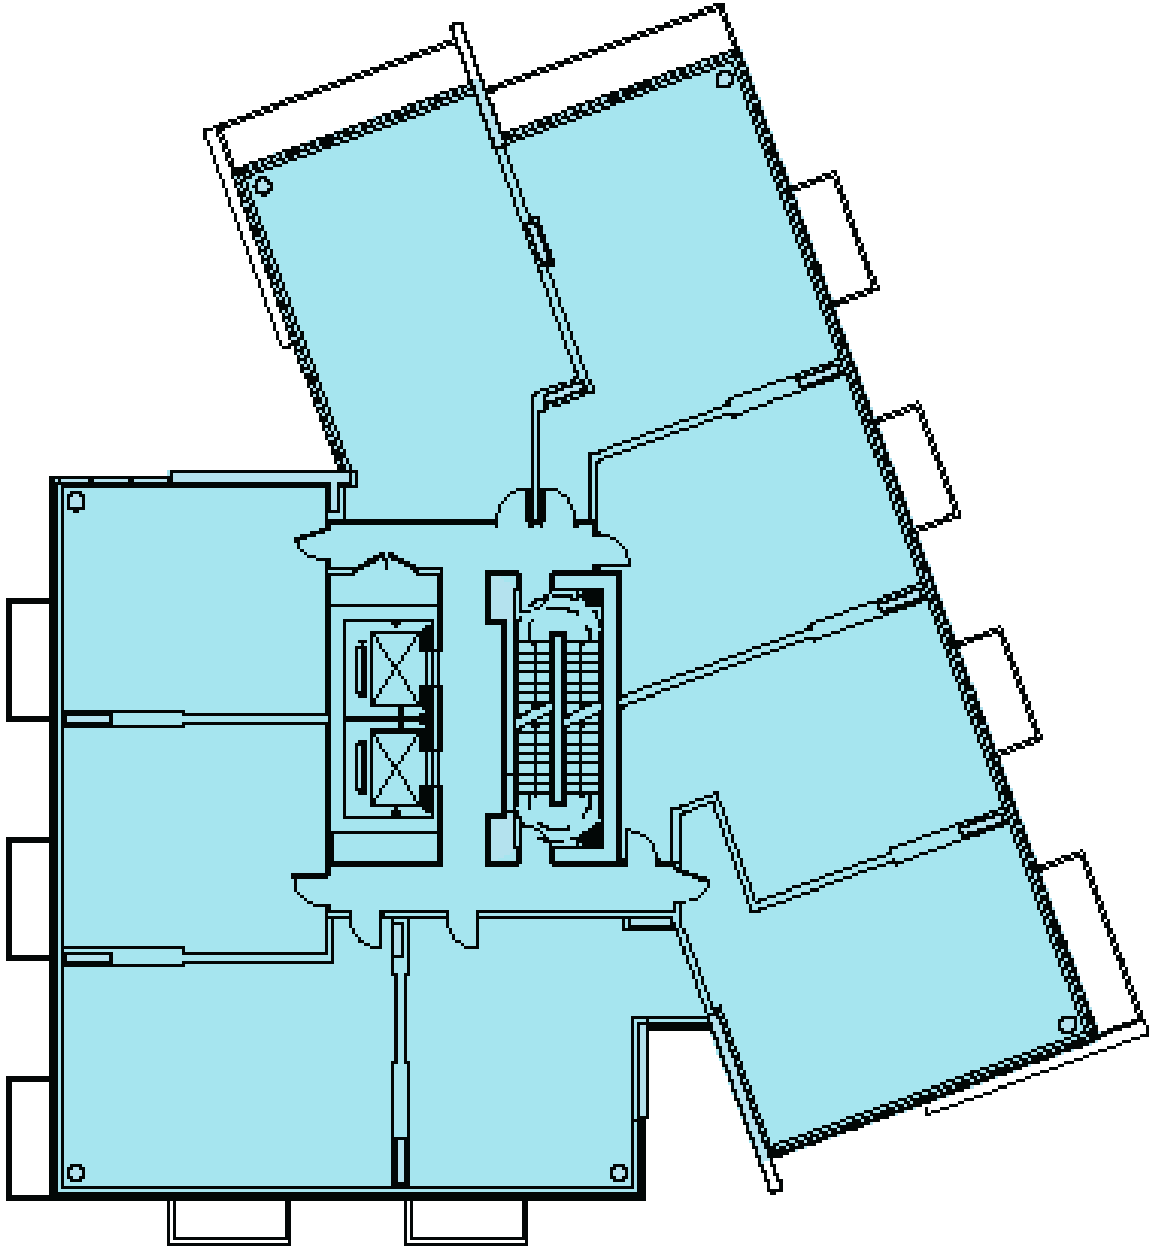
Typical Residential Floor Plan (Levels 6-24)
